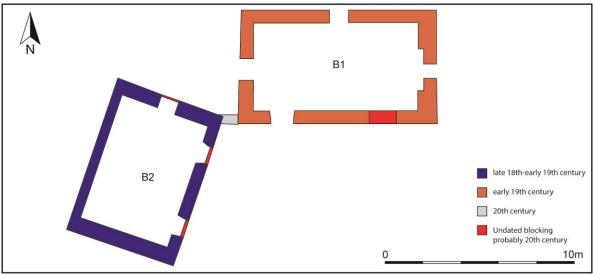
Plan of Higher Velly building complex showing phasing of first floor wall construction.
